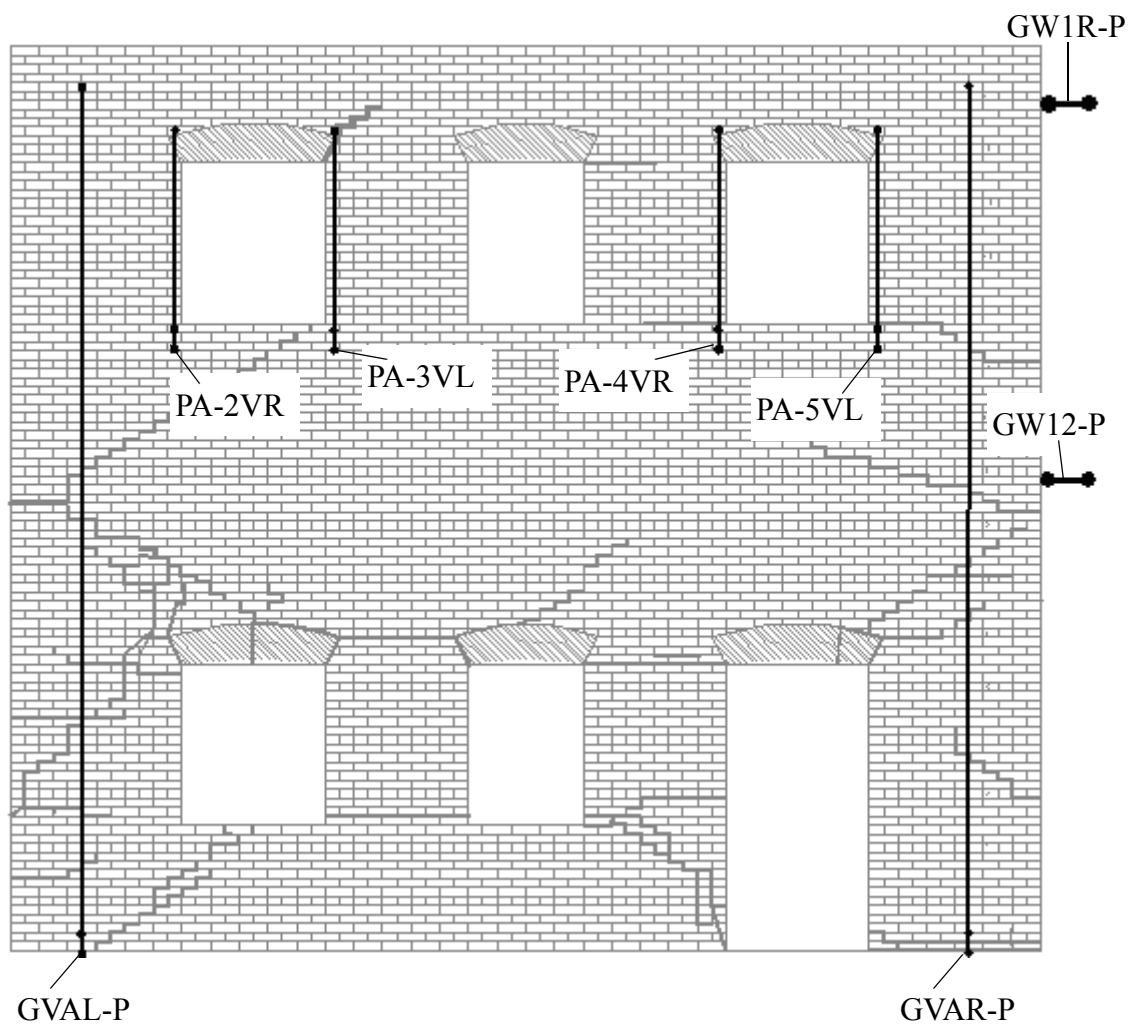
Elevation view of Wall A illustrating the location of potentiometers.
